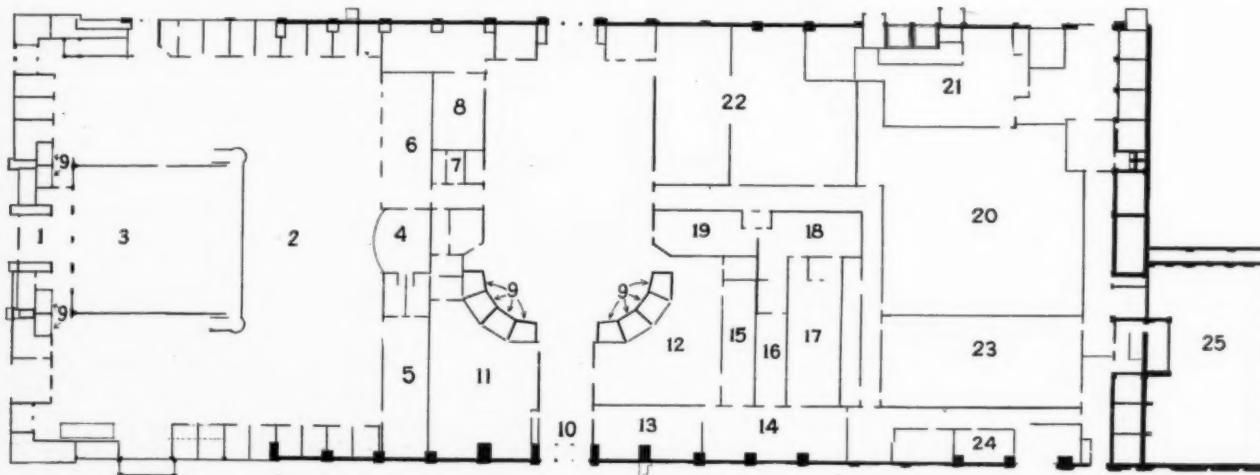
Plan of the main floor of Debarkation Hospital No. 3.
